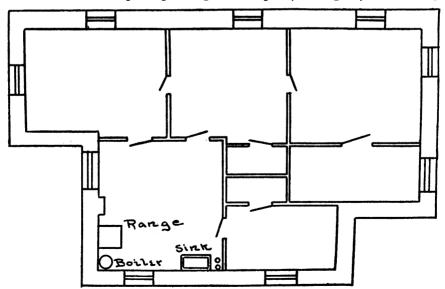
Showing First Floor Plan. Scale 1/8-inch to I foot.
